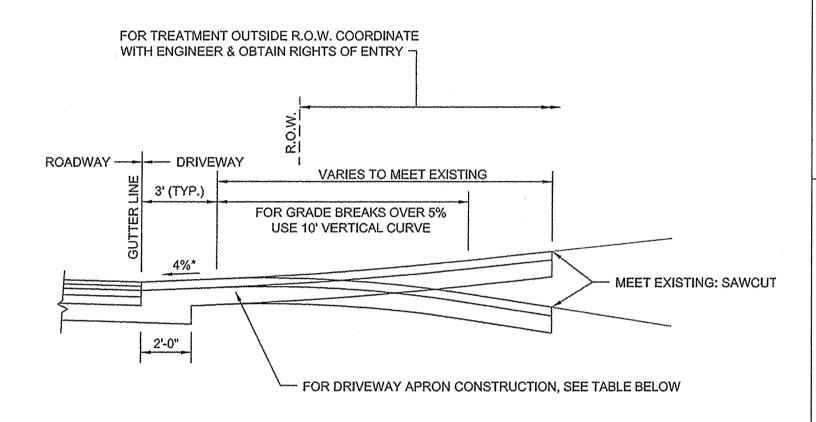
DETAIL NO. TYPICAL CURB CUT PLAN -FEB. 2010 TOWN OF FRAMINGHAM RESIDENTIAL DRIVEWAYS R-5.4.0 DEPARTMENT OF PUBLIC WORKS REV: NO SIDEWALK
